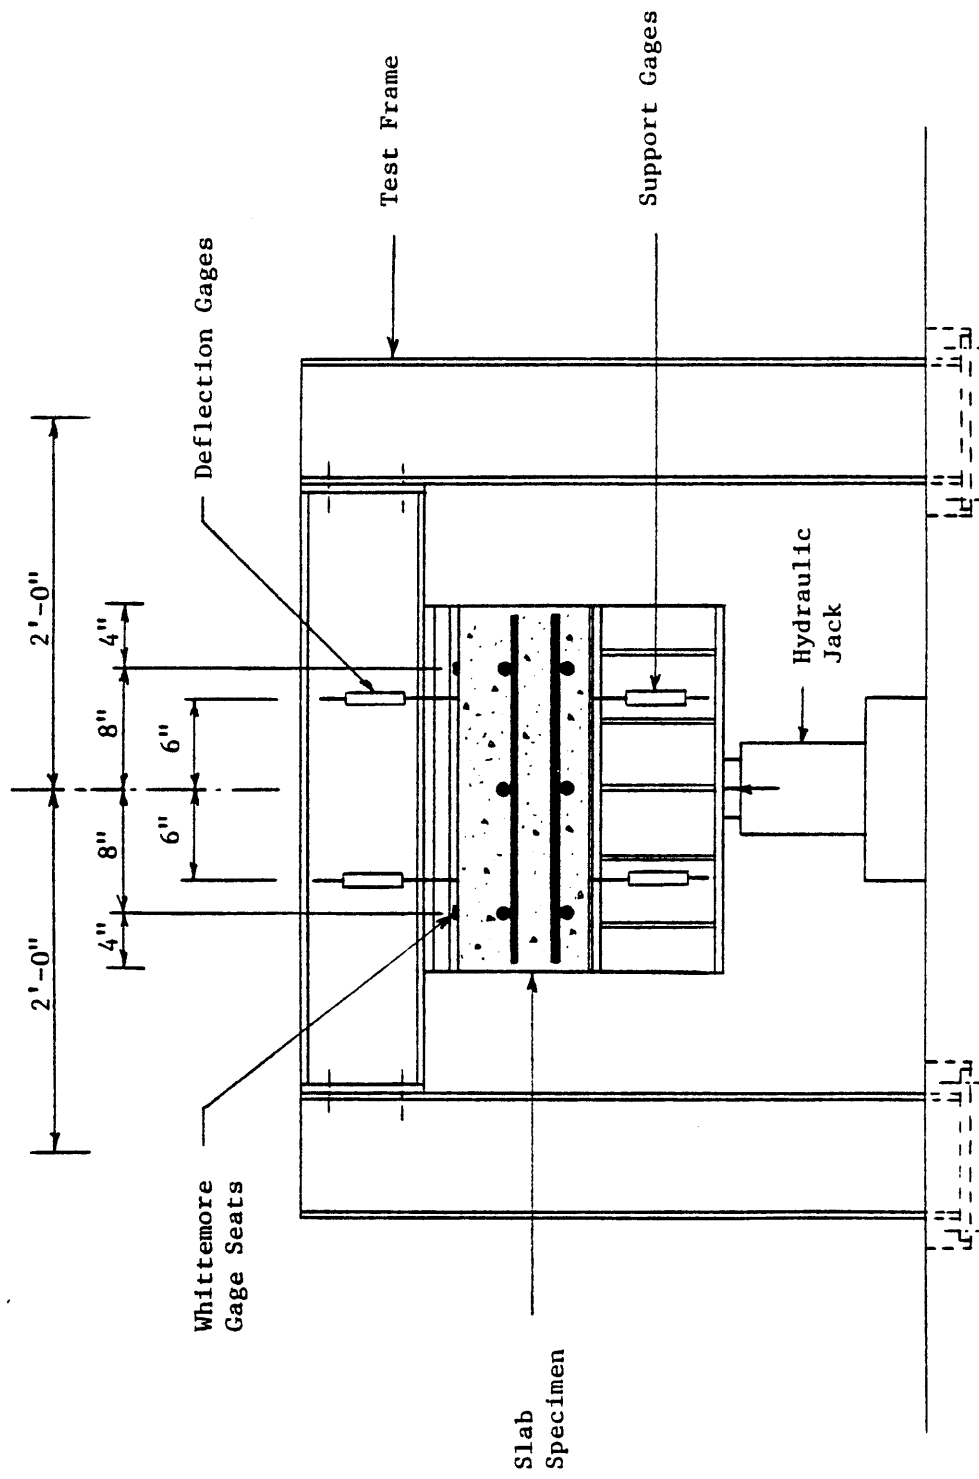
End Elevation of Slab Specimen Test Arrangement
